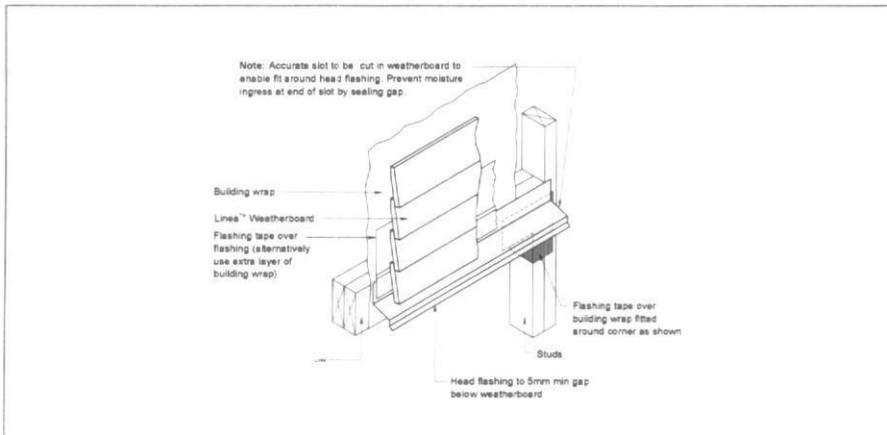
DIRECT FIX HEAD FLASHING TERMINATION
